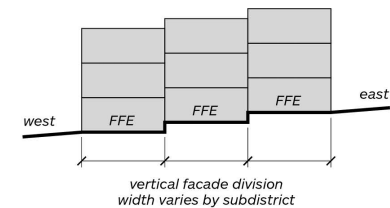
Figure XX - Building front elevation vertical facade divisions on sloped site diagram. Not to scale
